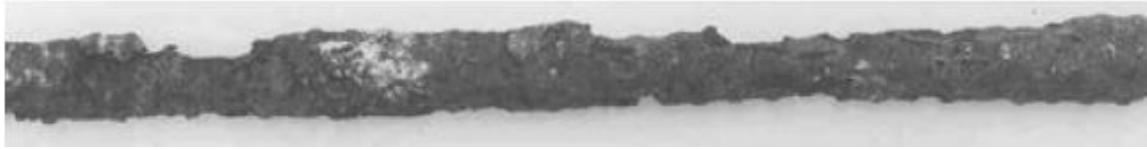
Sample Specimen from Abandoned Bridge in Montreal, Canada (Palsson and Mirza, 2002b).
